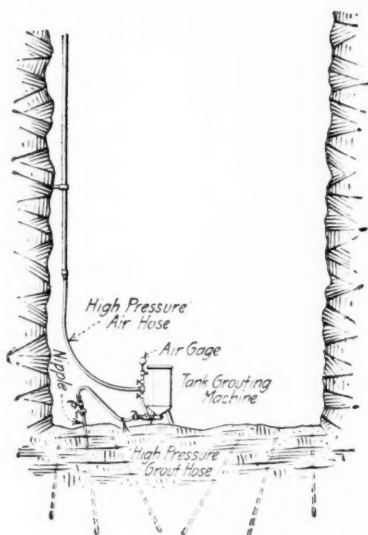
SHAFT BOTTOM, SHOWING ARRANGEMENT OF GROUTING DEVICE
